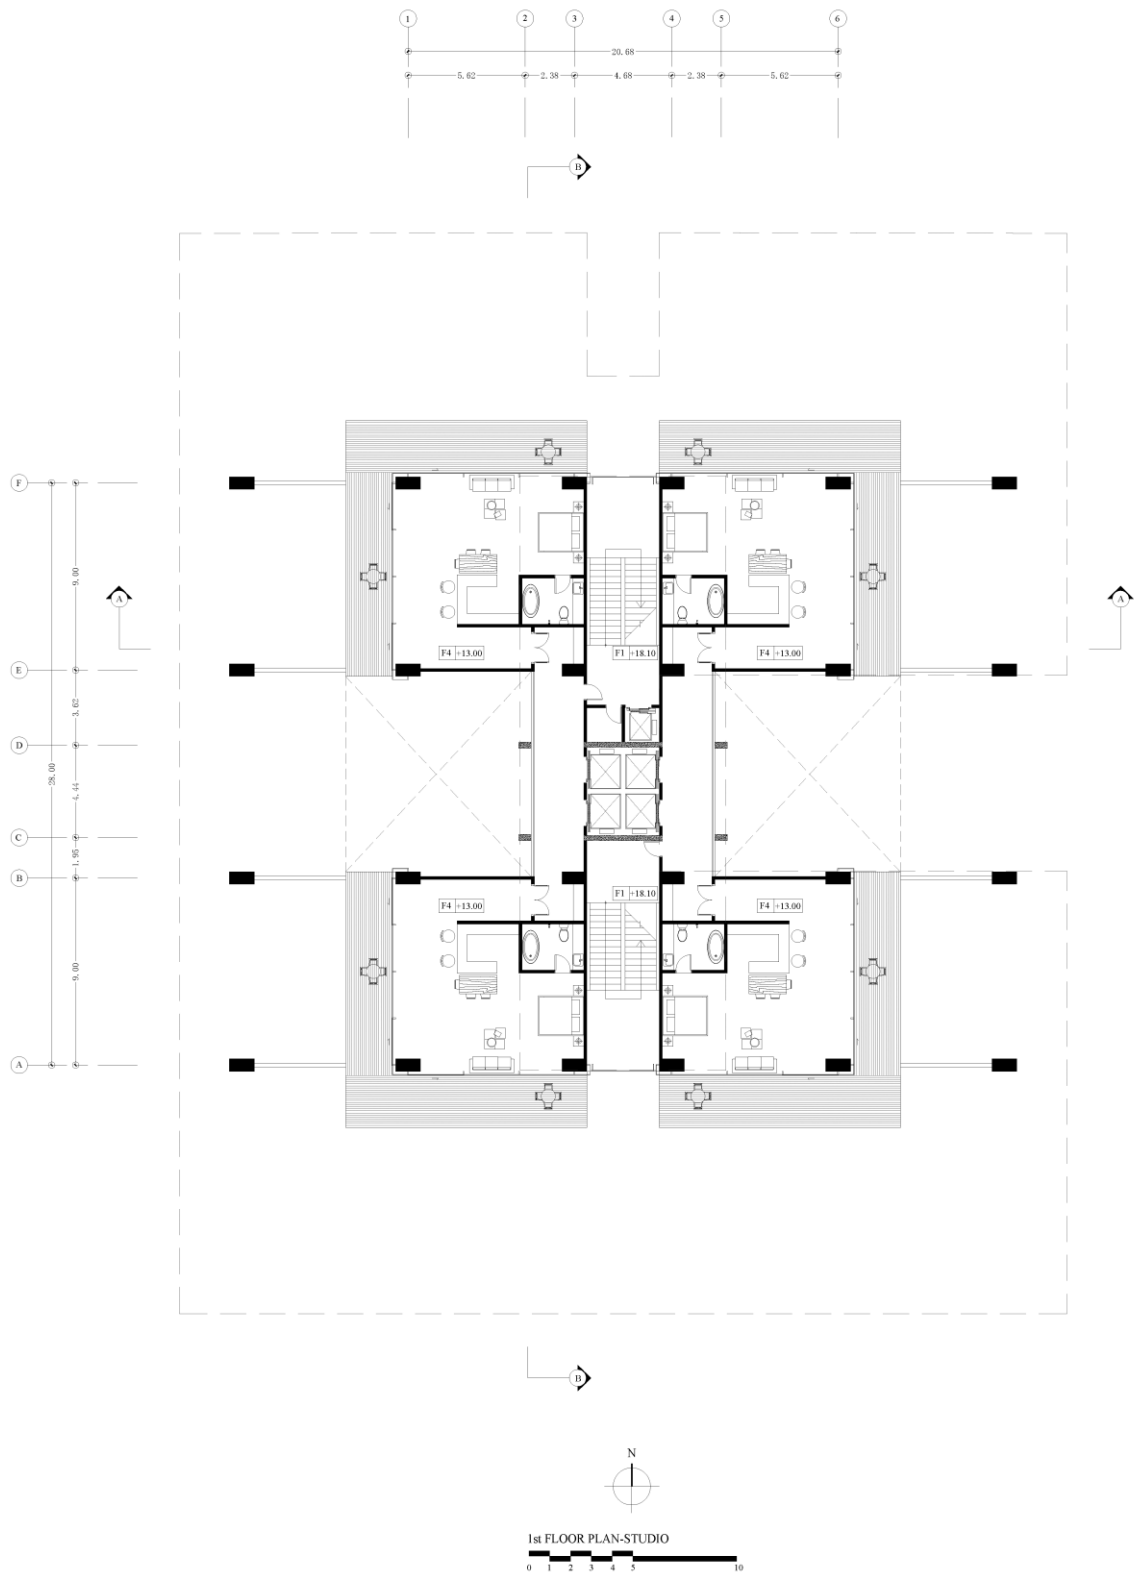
1st to 3rd Floor Plan: Studio Unit, drawn by the author.
